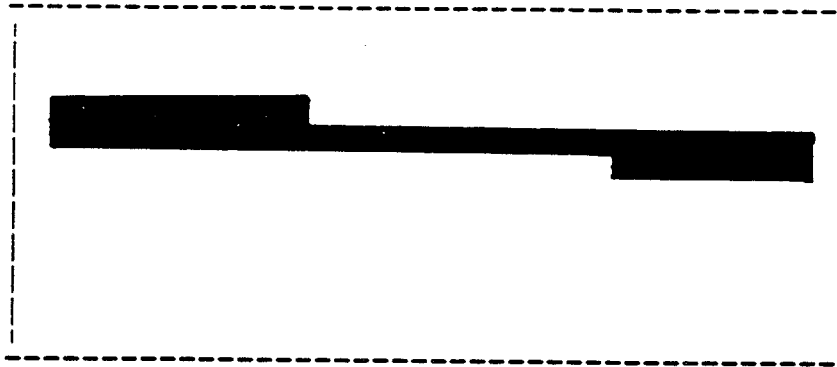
Reproduction of Pavement Crack through Digitized Processing
